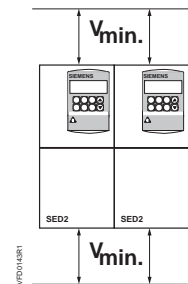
IP20 SED2 Mounting Dimensions in Inches (Millimeters).
